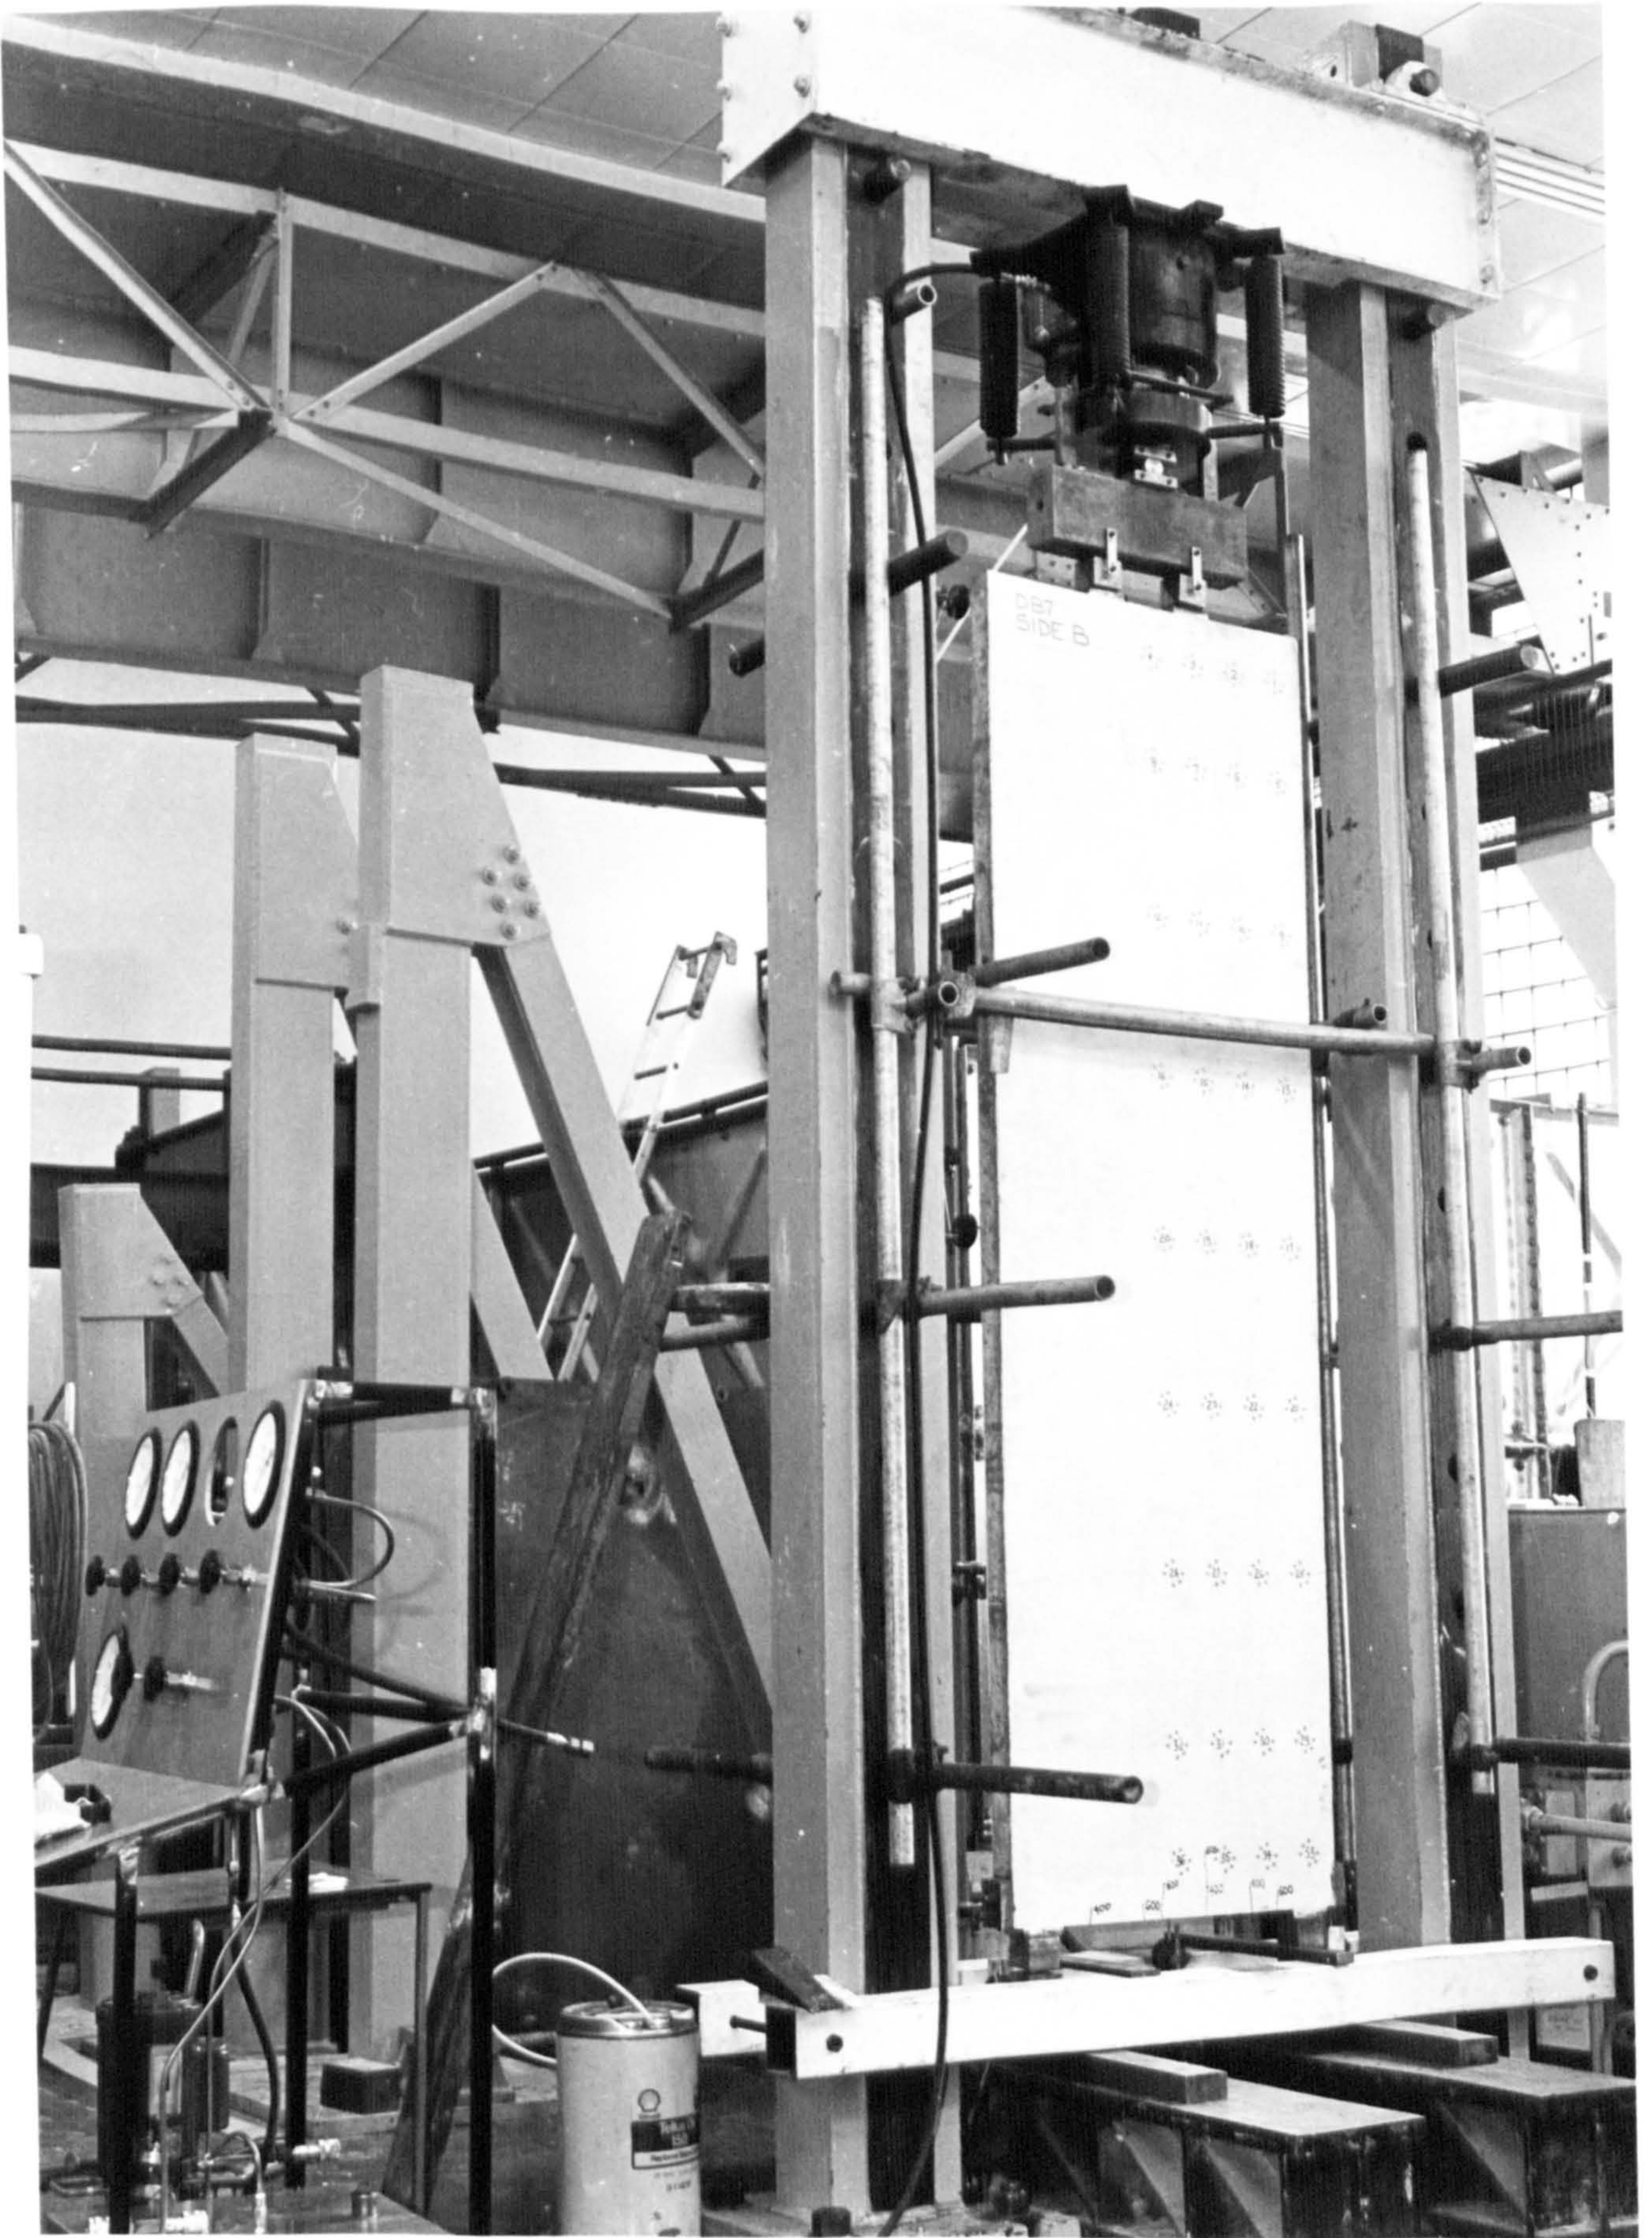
Arrangement of machine and frame used for testing deep panels
